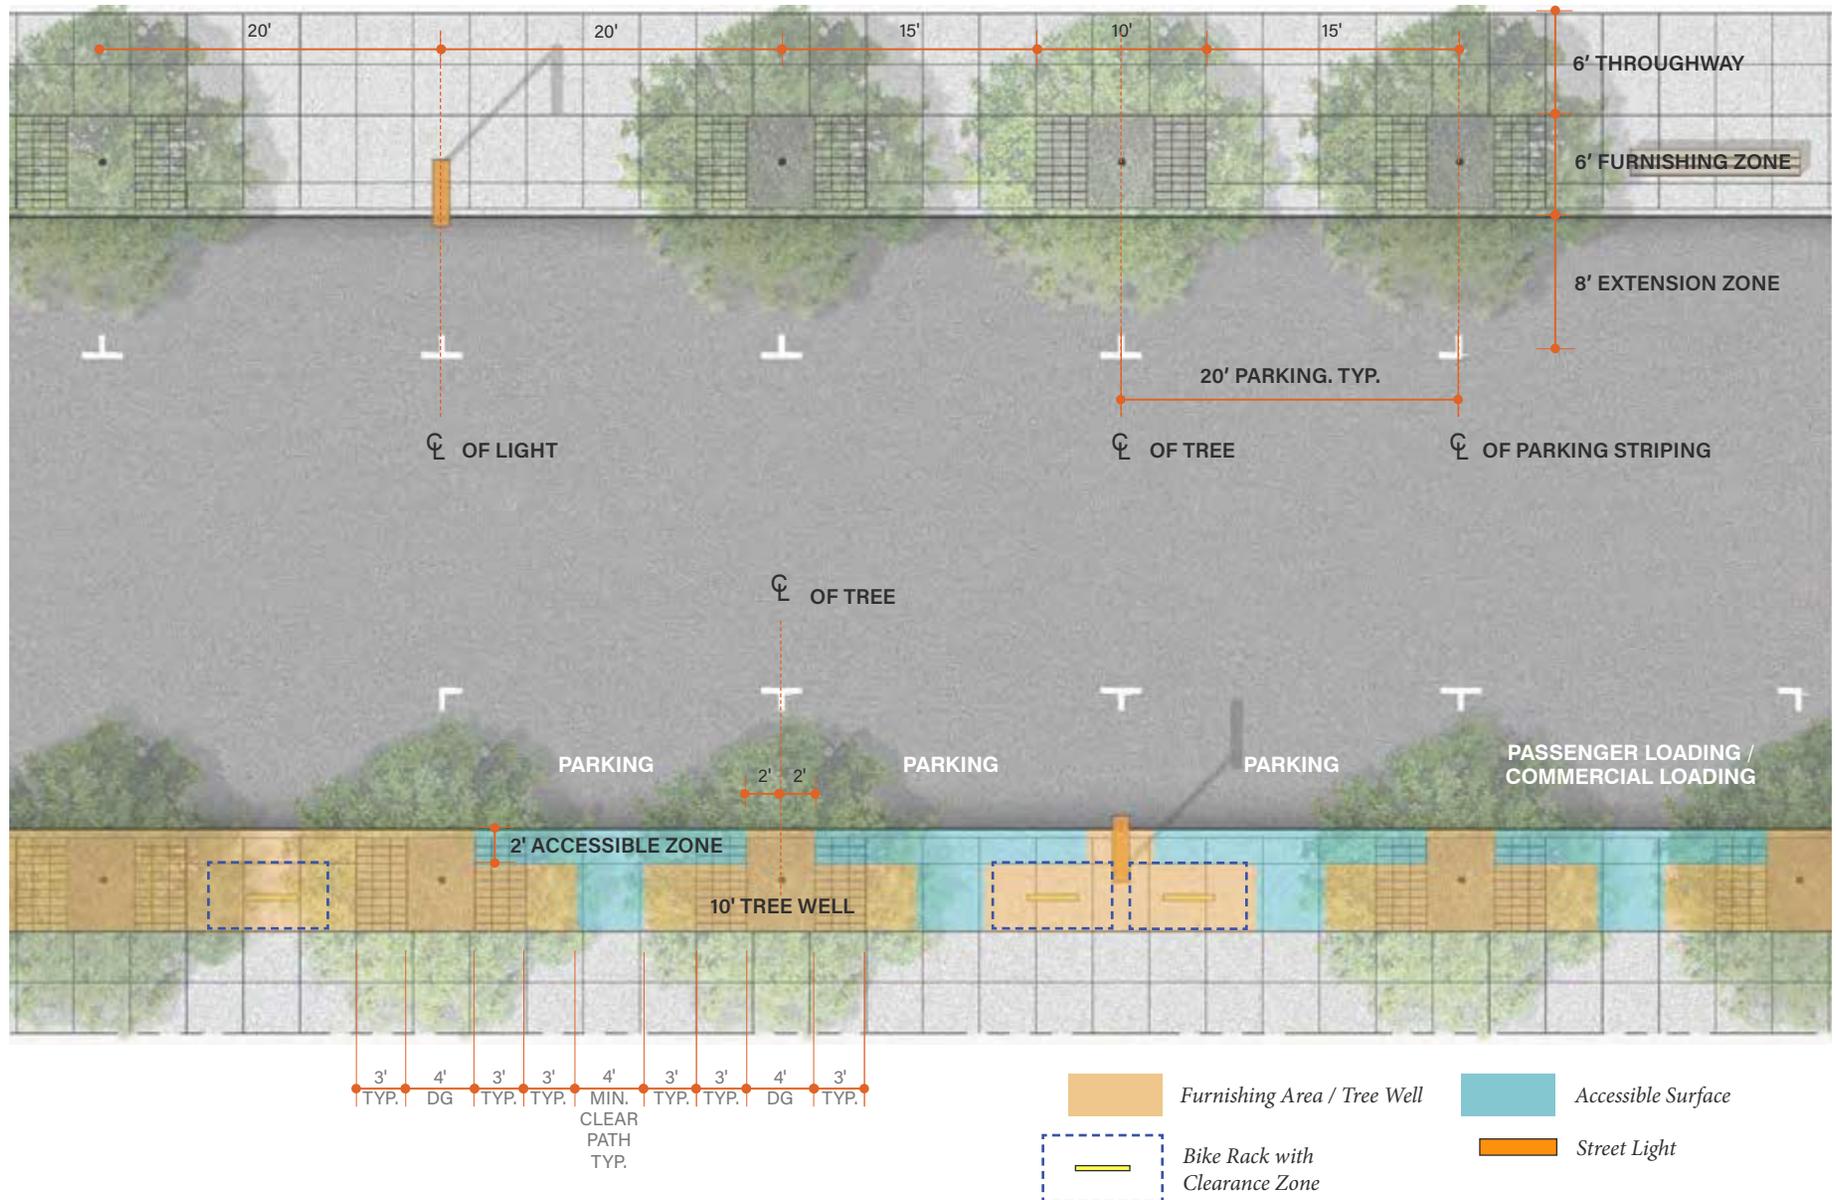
Typical Streetscape Accessibility Requirements and Layout
